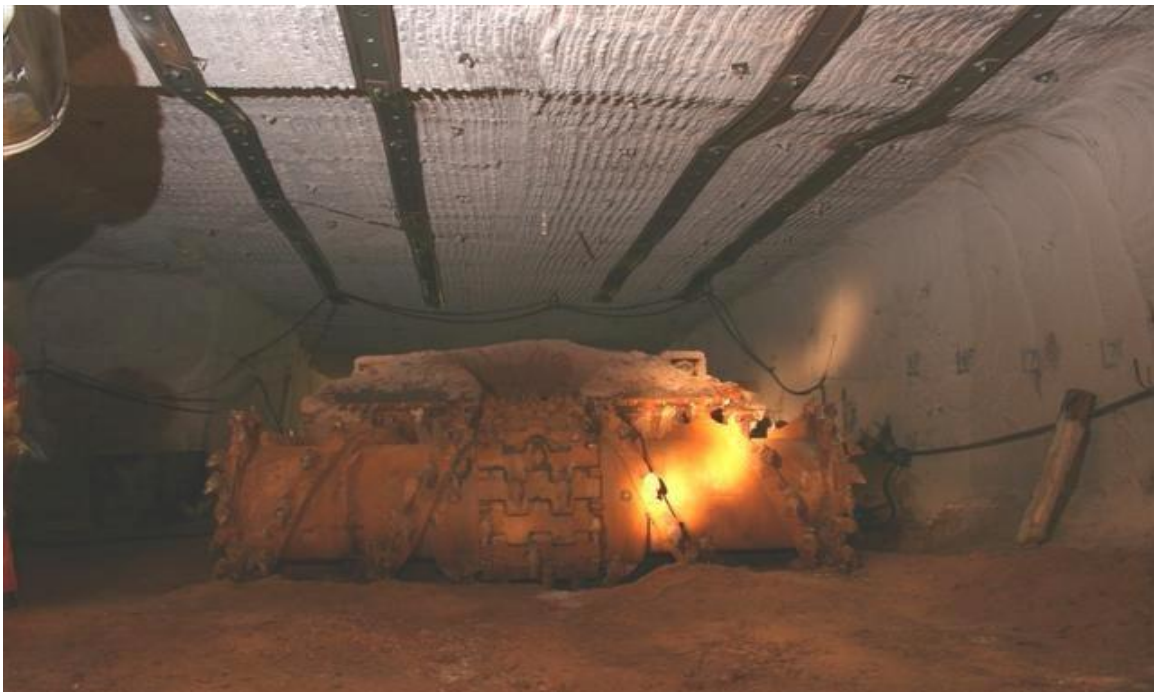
A continuous miner at a working salt face at Boulby mine (source Boulby, 2009)
